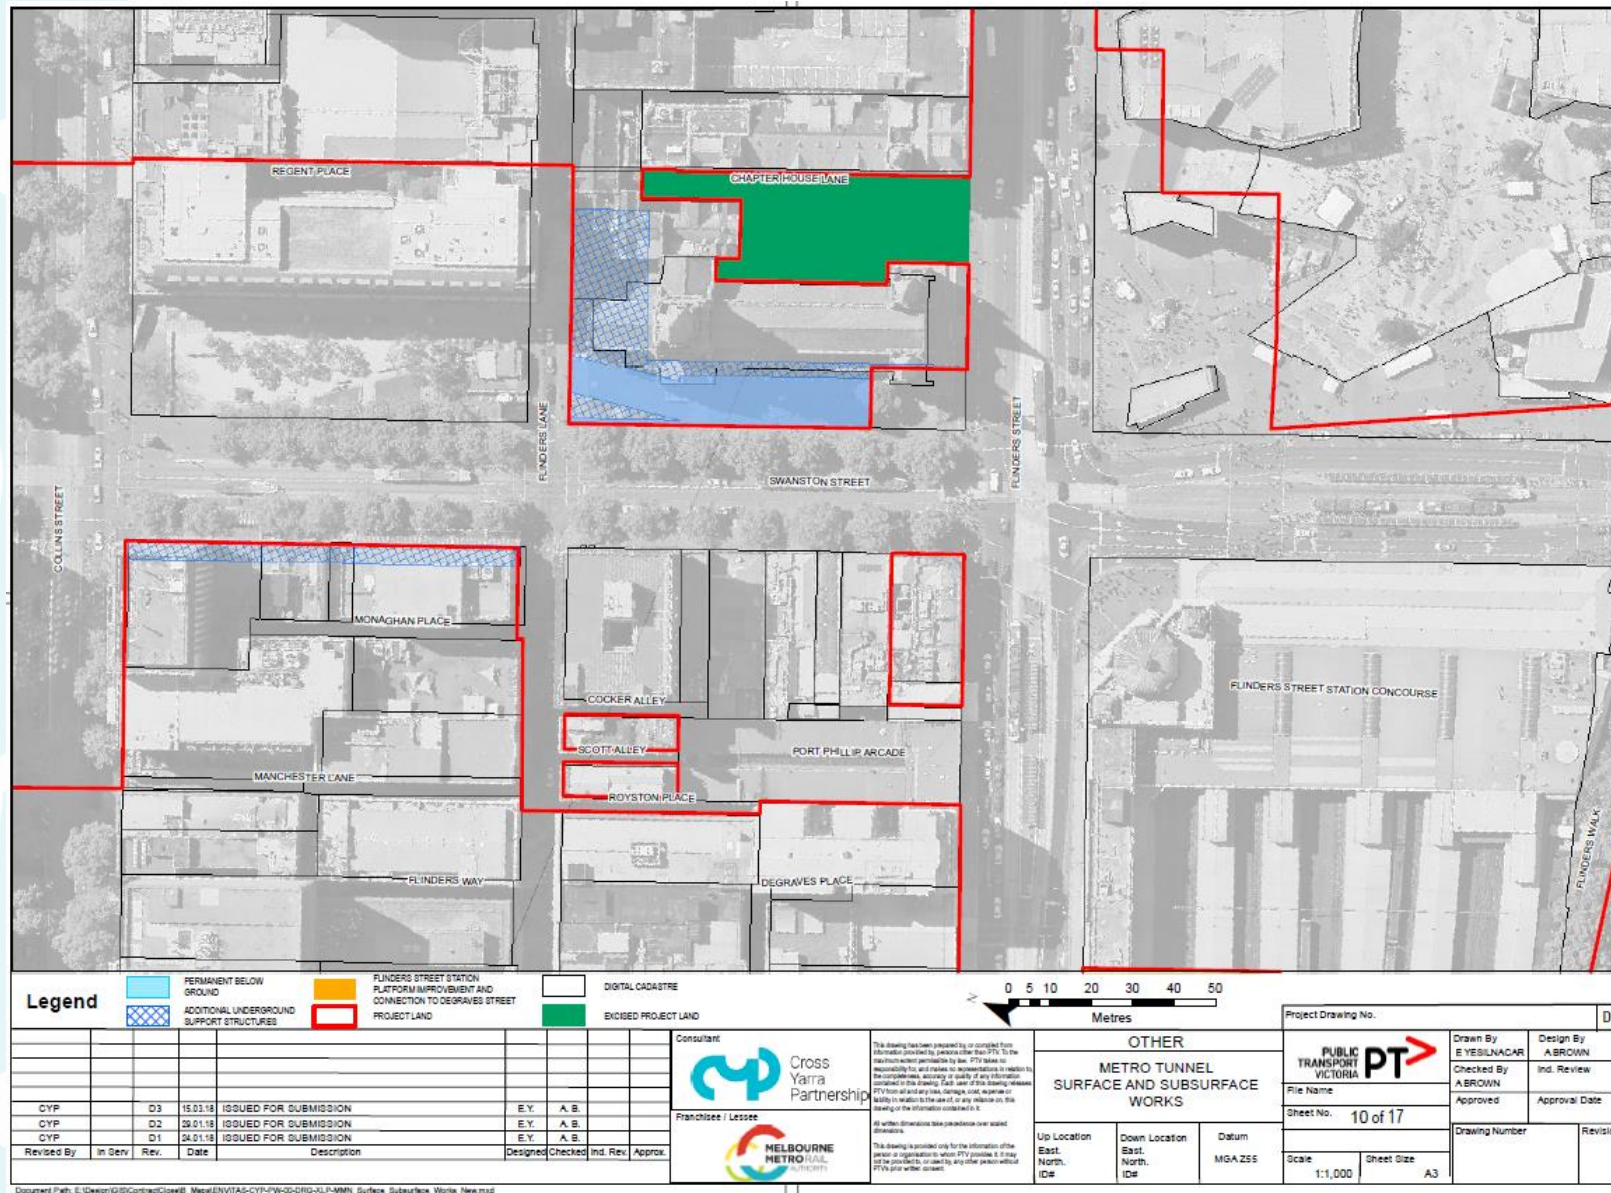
ADDITIONAL PROJECT LAND REQUIRED FOR UNDERGROUND SUPPORT STRUCTURES, TUNNEL ALIGNMENT AT CBD SOUTH STATION AND EXCISED LAND
